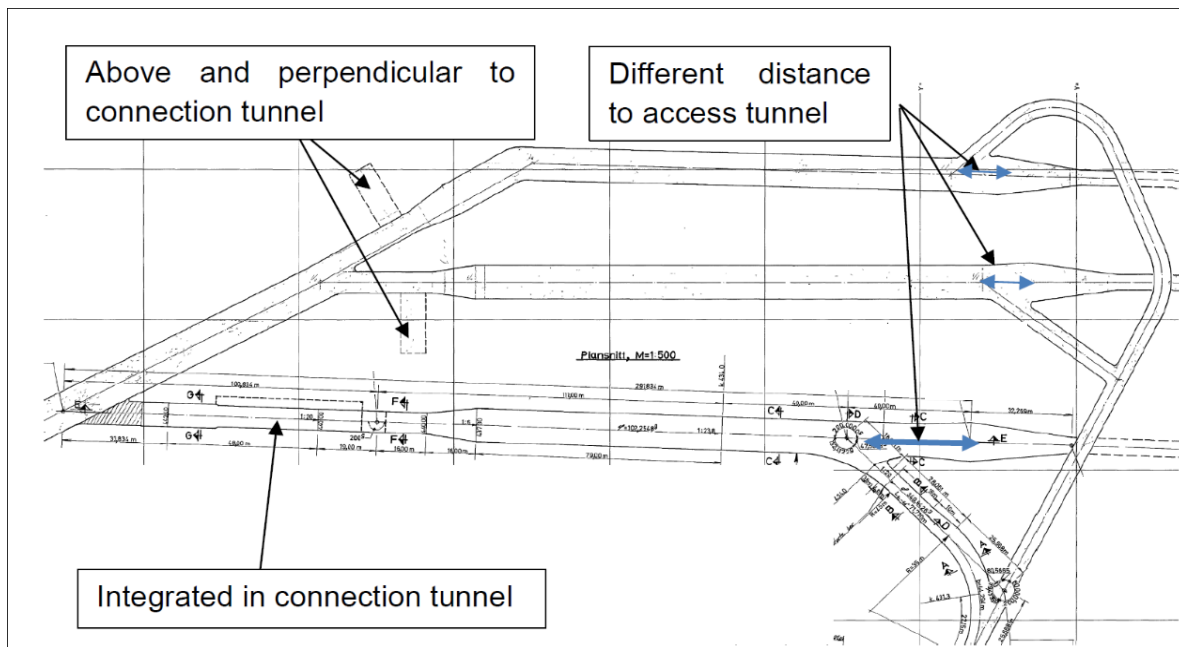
Plan view of sand traps of Tonstad HPP [12]
